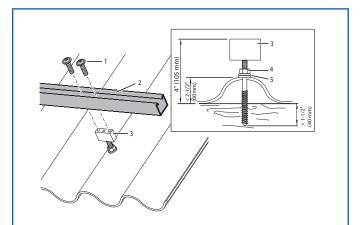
Example of profile rail attachment with rooftop installation on a corrugated sheet roof. Use of a roofing contractor is highly recommended.
